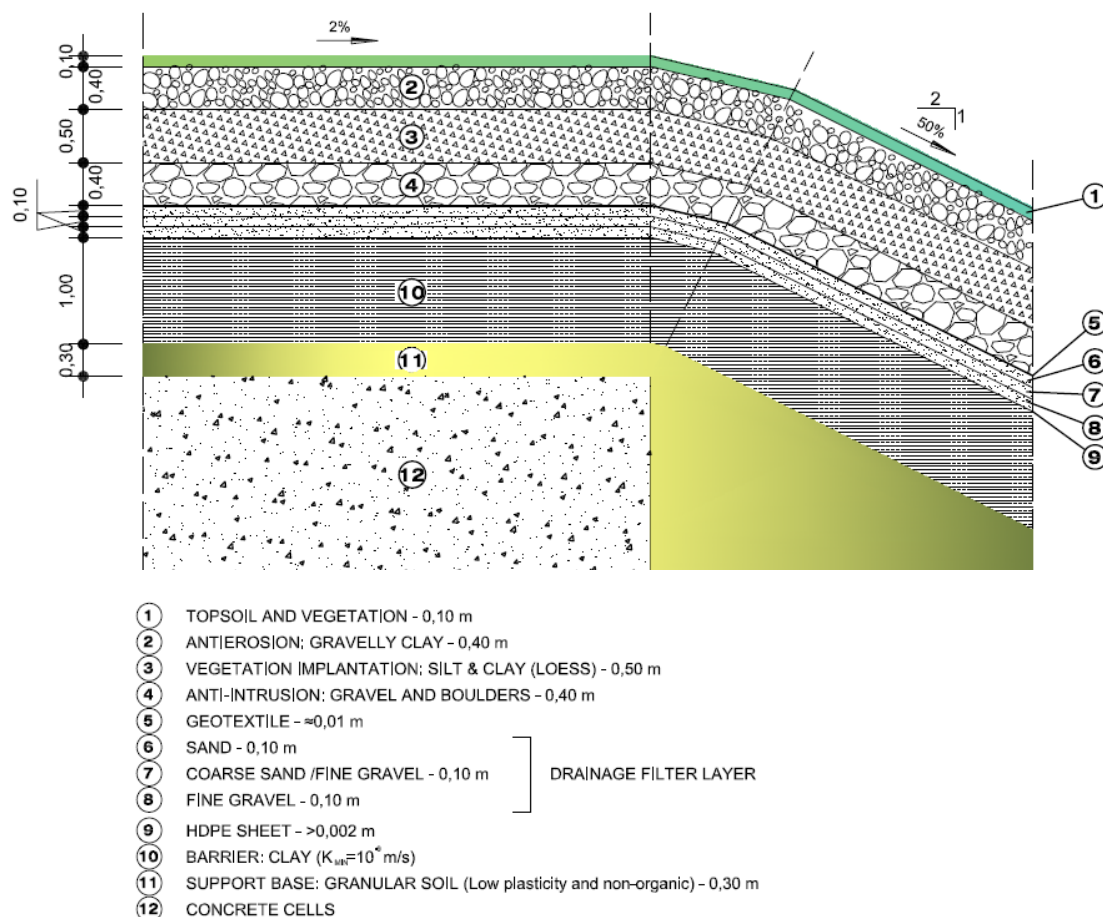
PROTECTIVE MULTI-BARRIER COATING OF A TRENCH-TYPE REPOSITORY
